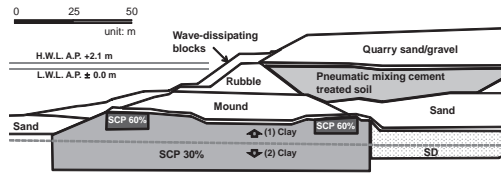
A typical cross-section of the mild slope rubble seawall (general seawall section). SCP: Sand Compaction Piles; SD: Sand Drains.
